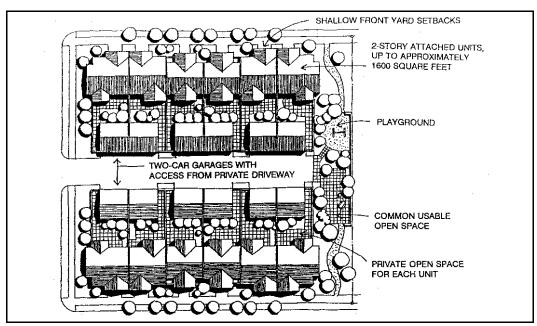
Typical Multi-Family Project at 20 Units/Acre
